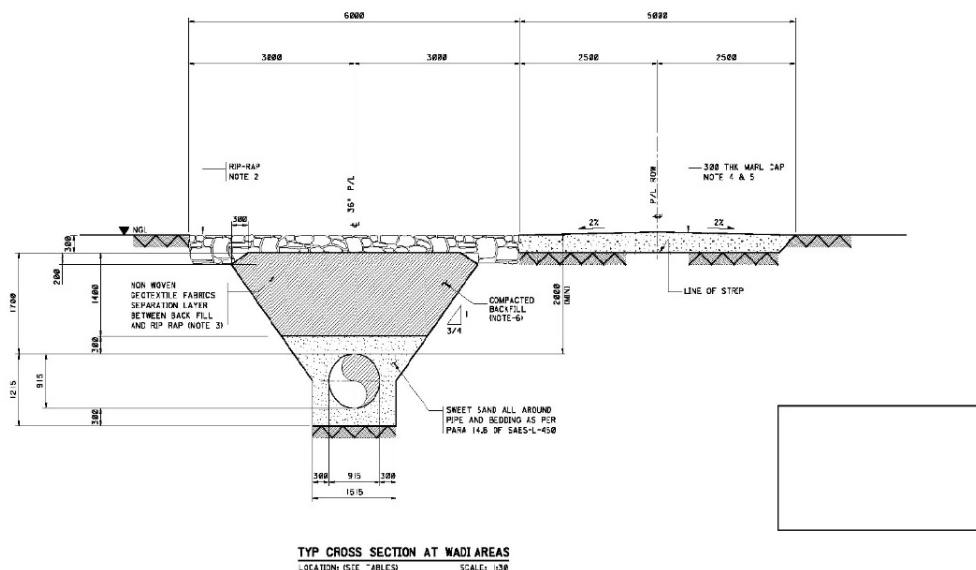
Typical diagram of Wadi depression pipe trench and work zone
